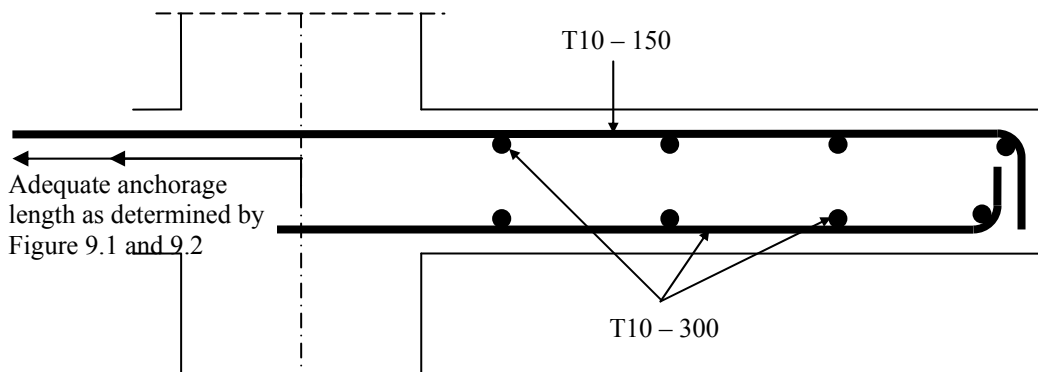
Reinforcement Details for Worked Example 9.1
